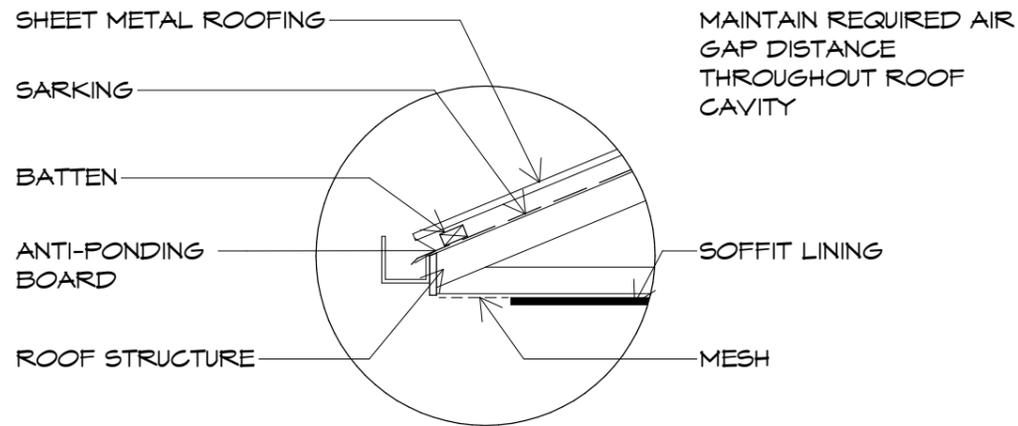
EAVED ROOF WITH BUSHFIRE CONSIDERATIONS SHOWN
